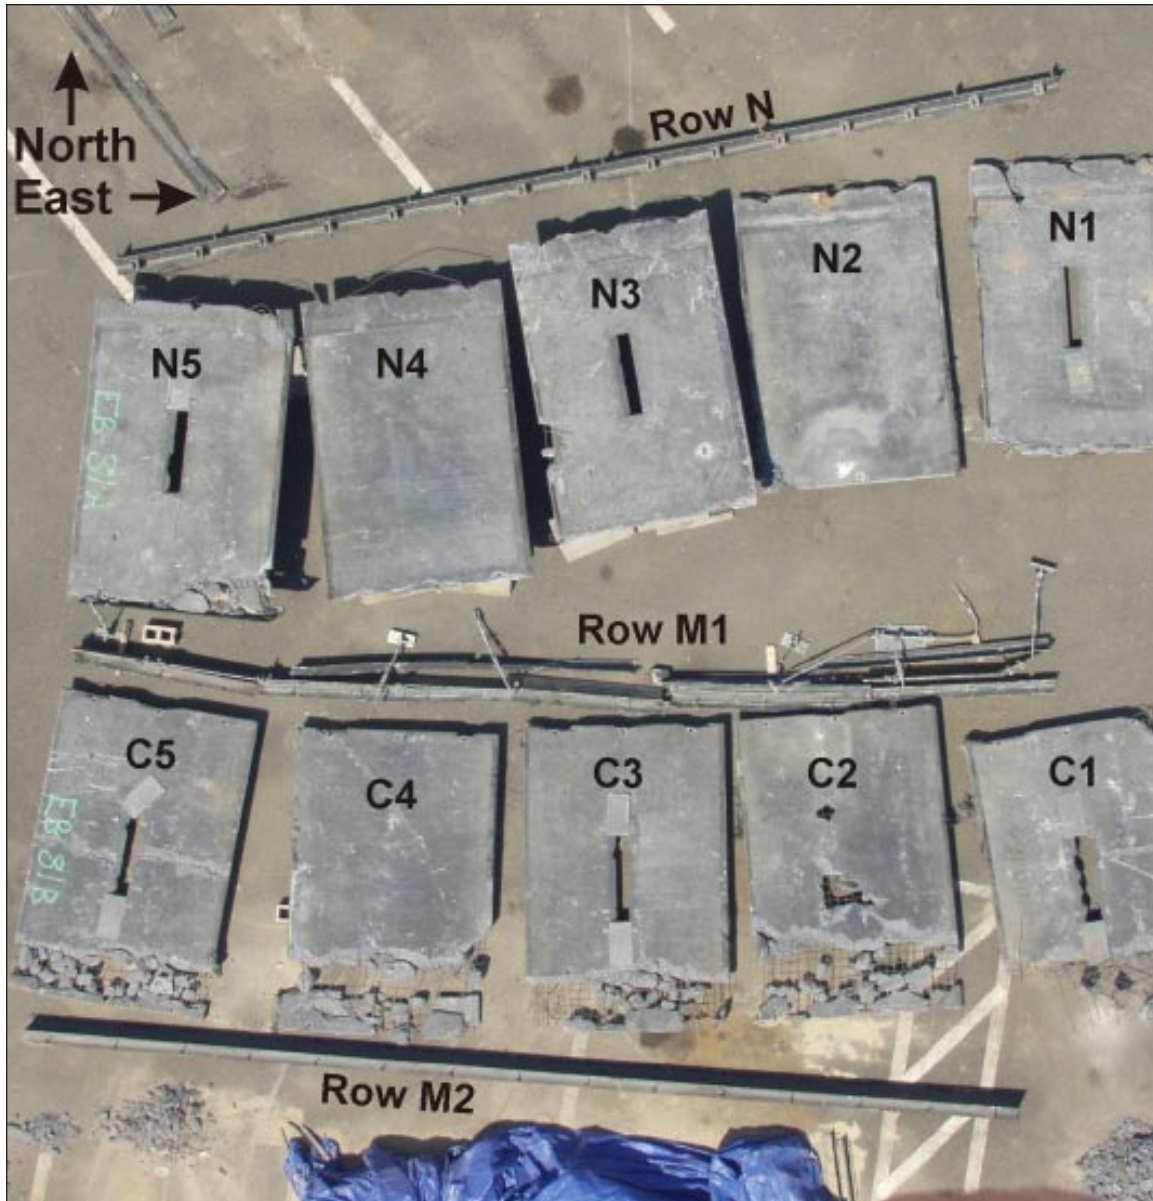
Collapsed panels after removal from the tunnel as rearranged in their original positions within the ceiling module. The upper surfaces of the panels are shown. (Photograph courtesy Massachusetts State Police)
